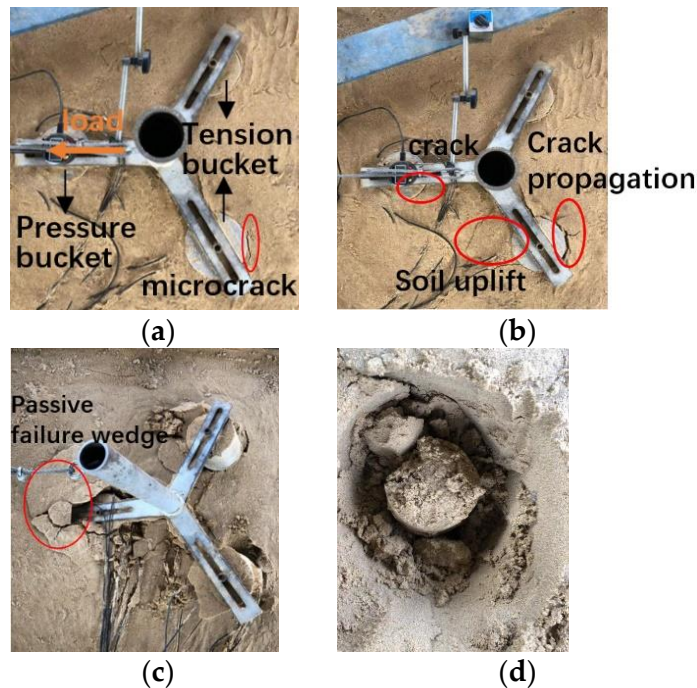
Failure process of the tripod bucket foundation under $H-M$. (a) Initial stage; (b) intermediate stage; (c) failure stage; (d) soil plug.
